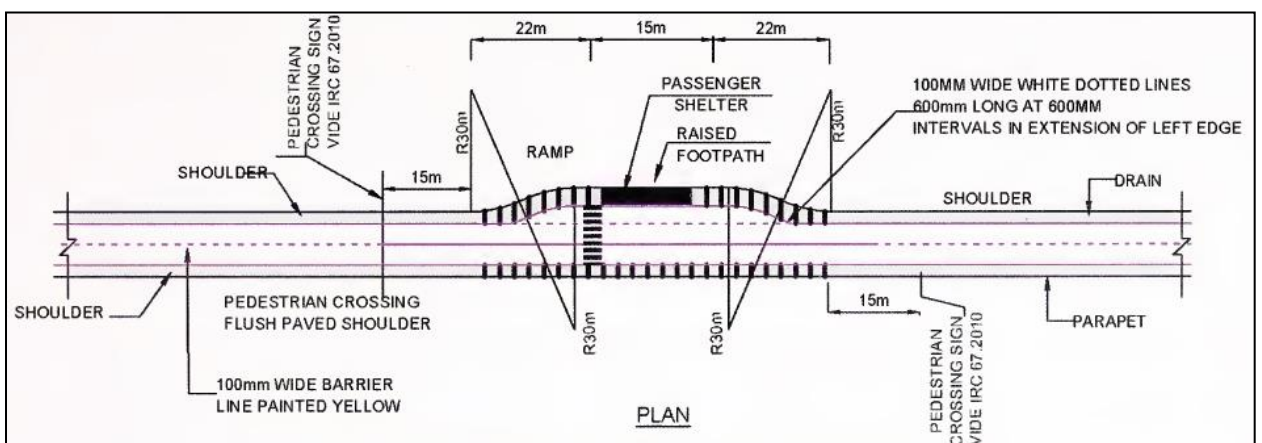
Typical Layout of Pick-up Bus Stop on Hilly Area
